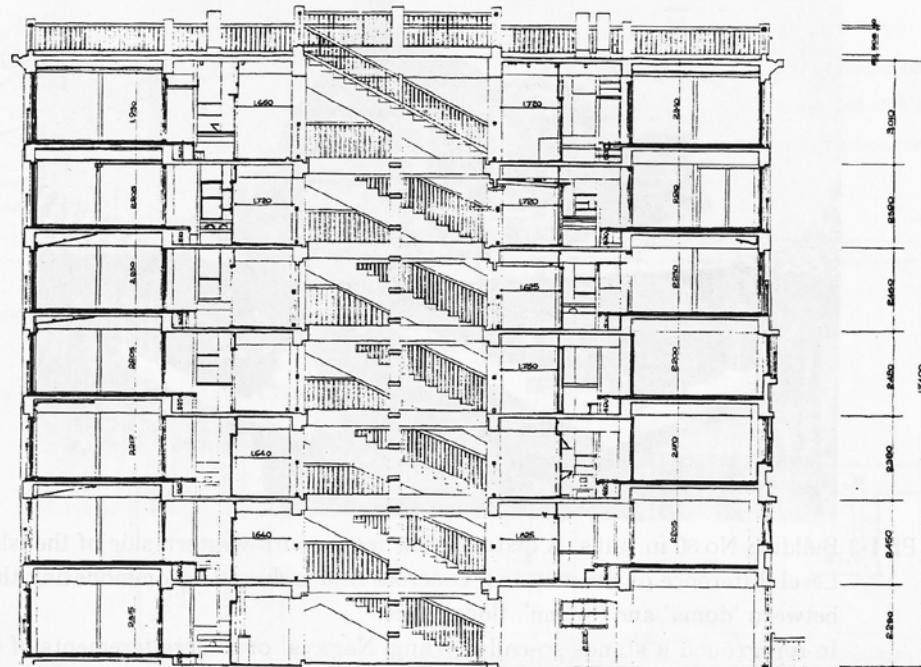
Section (surveyed) of building No.30. 1/200. Around the well hole
